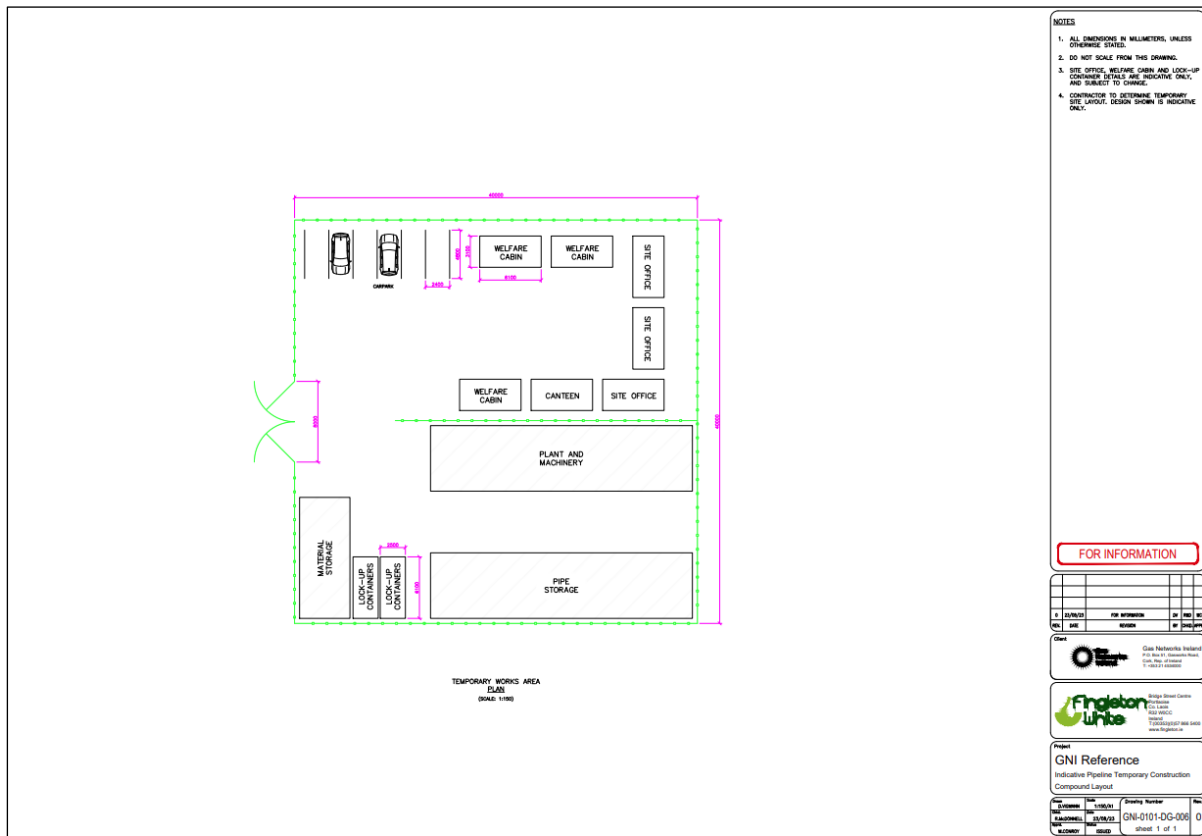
Typical Construction Compound Layout (Fingleton White Drawing GNI-0101-DG-006)
